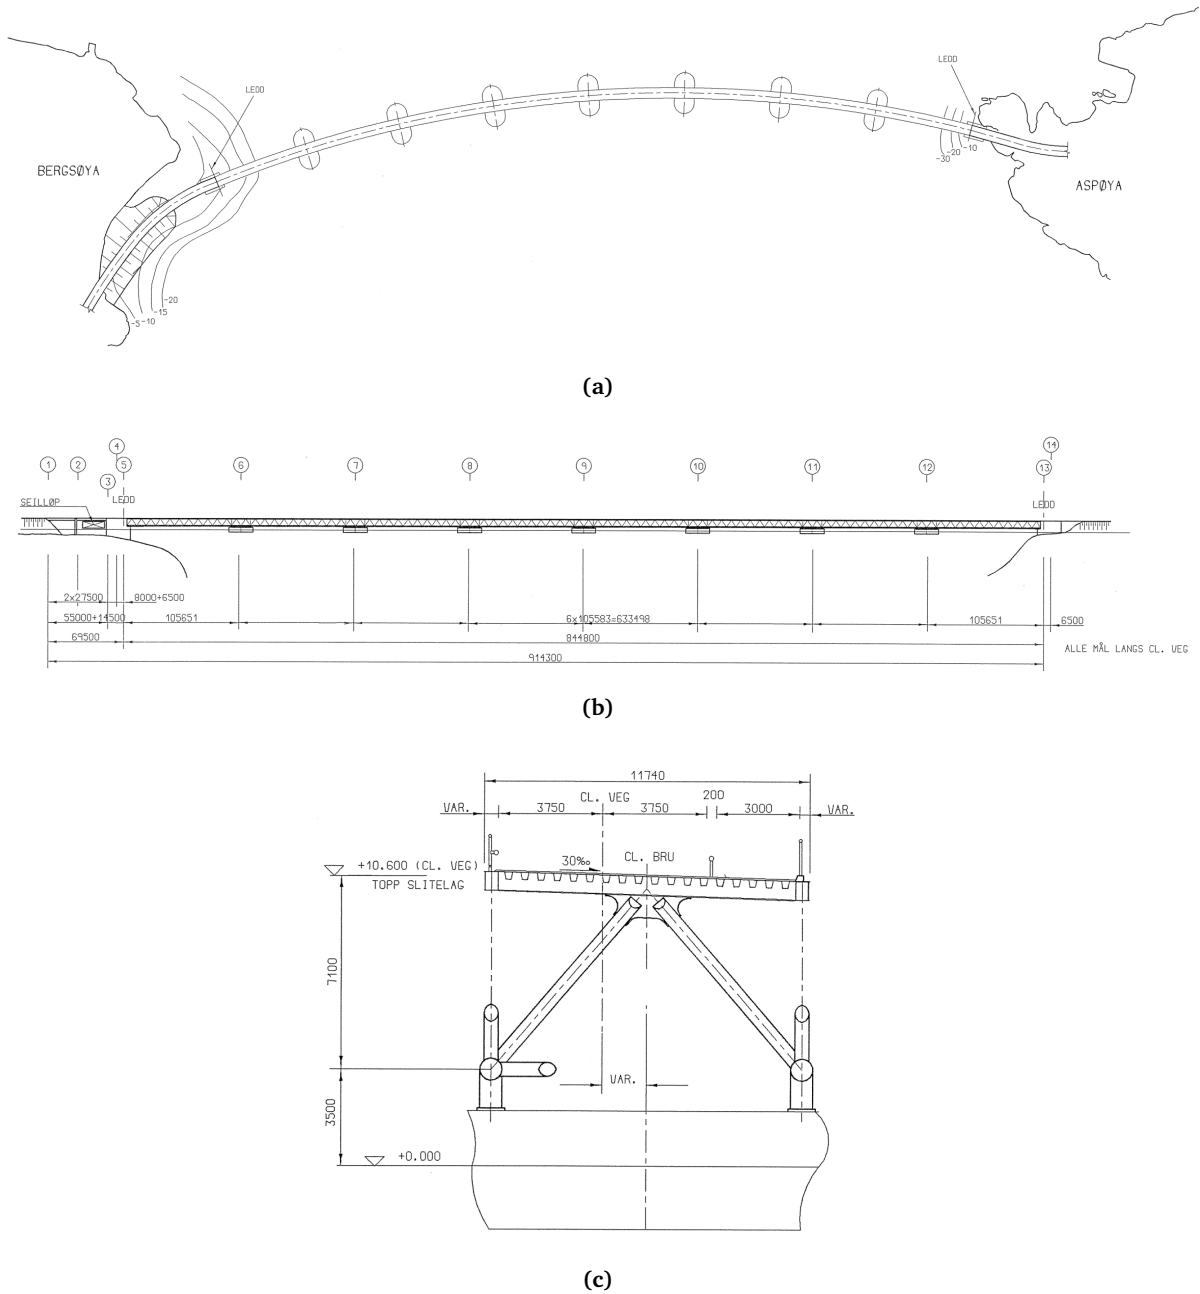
Structural drawings of the Bergsøysund Bridge. Drawings by Vegdirektoratet/Veritec/Johs Holt. (a) Plan, (b) Elevation, (c) Cross section.
